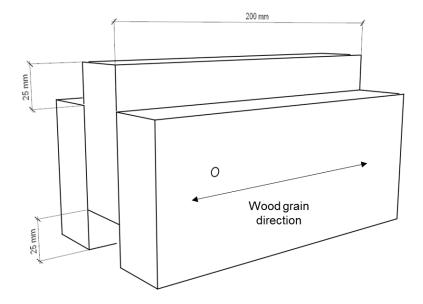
Nail connection test specimen with nails perpendicular to wood grain
